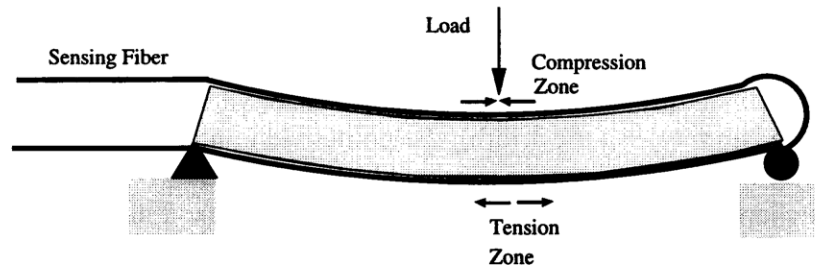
Geometric layout of sensing fiber for the simply supported beam
